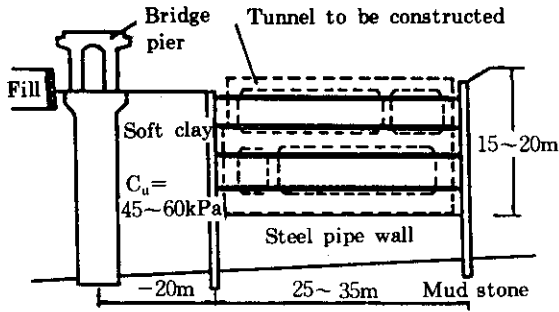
Braced Walls for Excavation of Tunnel by Cut-and-Cover Method and Adjacent Bridge Pier.
